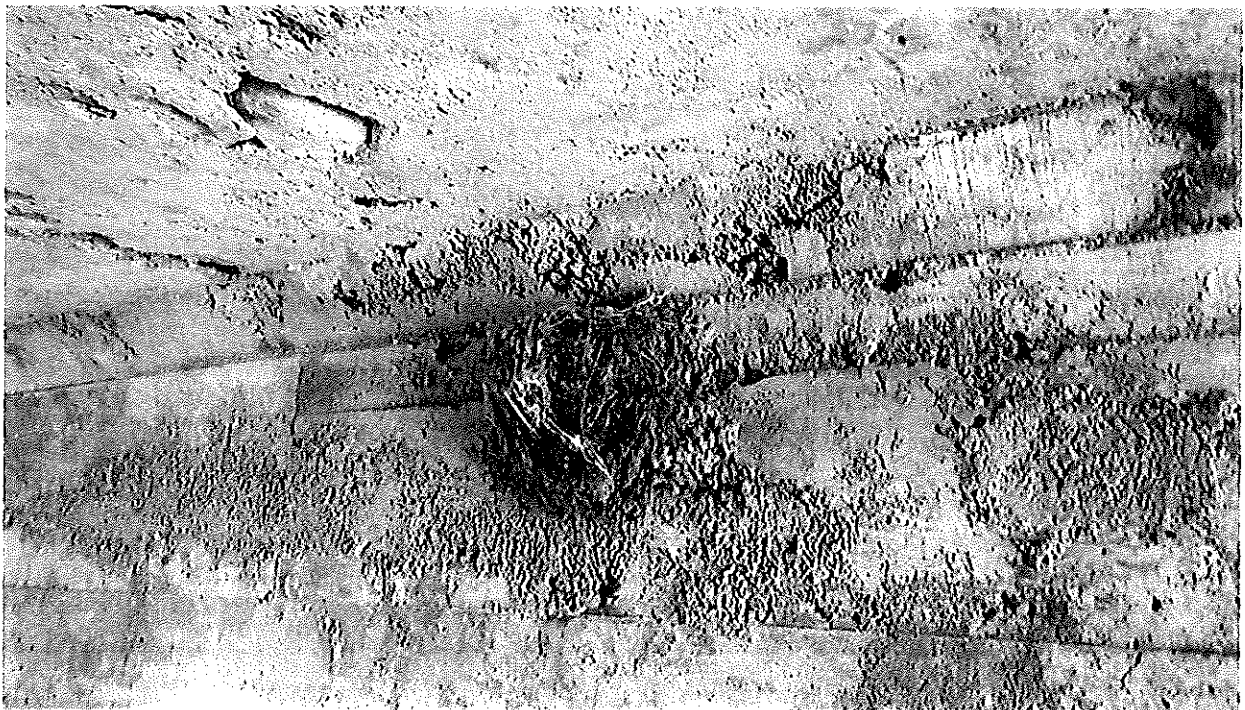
Abandoned birds nest inside the existing concrete box culvert
